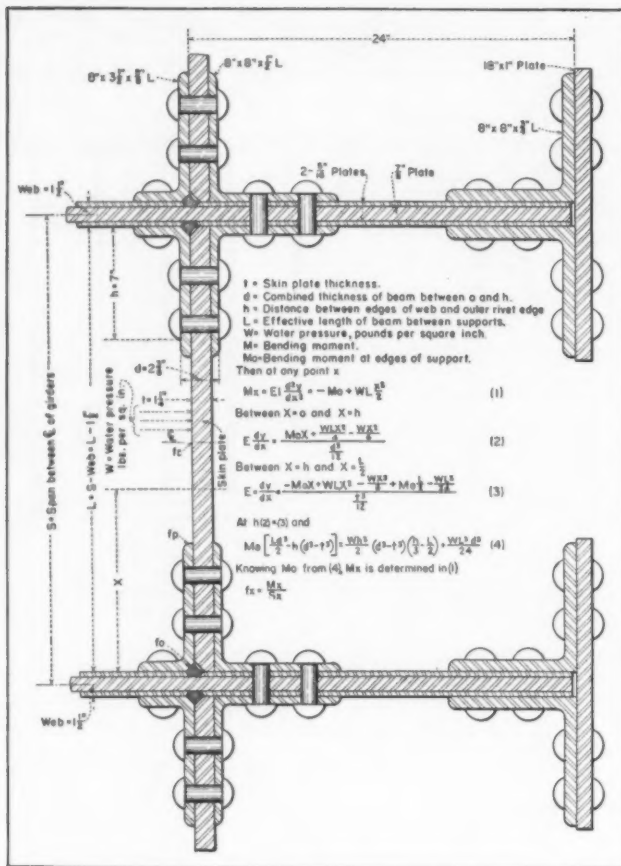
SKIN-PLATE ASSEMBLY WITH ACCOMPANYING EQUATIONS
